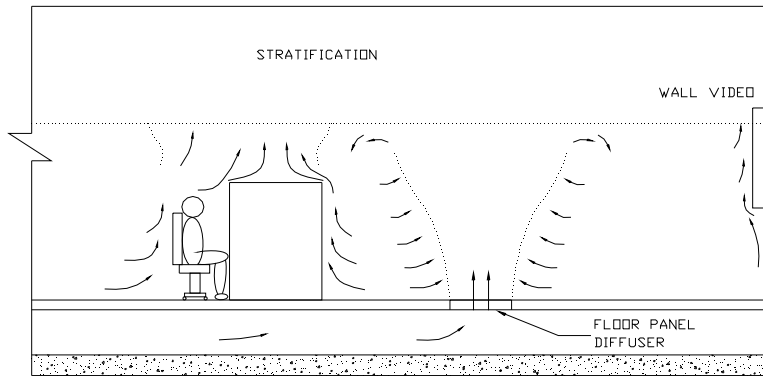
Sketch for Underfloor Air Distribution for a Control Center
